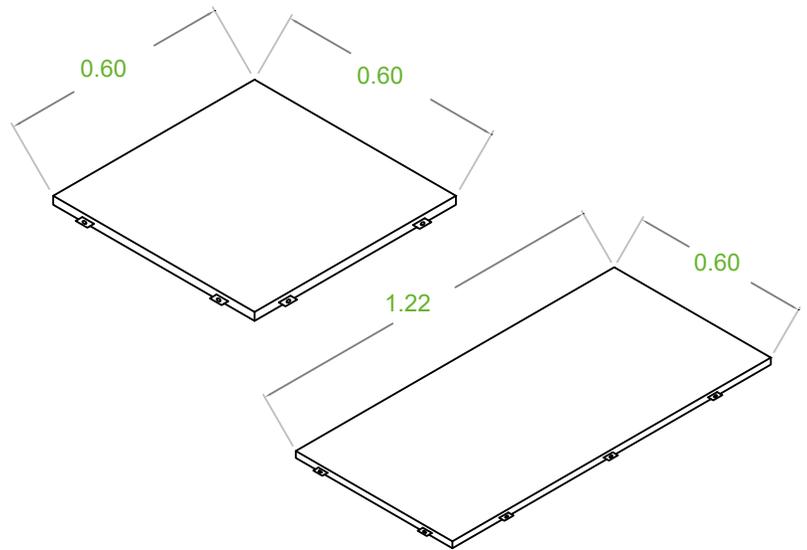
PLATE: A new type of construction technology in wall decoration. The method of metal pendant will be hanging directly on the wall or hanging in the wall hanging on the steel frame, no grouting paste. The principle is the main structure of the main force on the point, through the metal pendant plate will be fixed in the building, the formation of decorative curtain wall.
